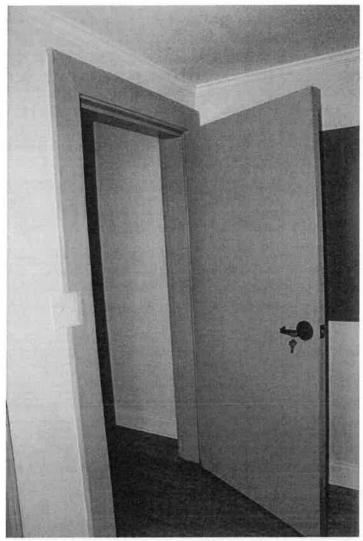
Standard door casing to each unit with new flush fire-rated doors to units
